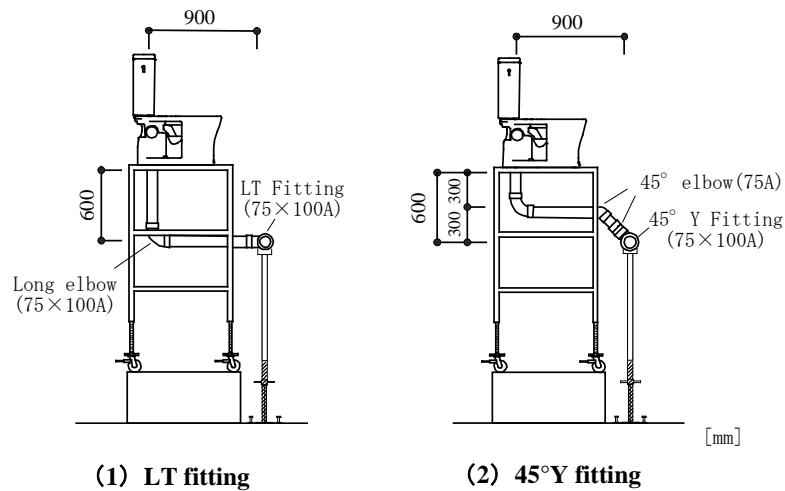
Fittings used for connecting the horizontal fixture drain branch
